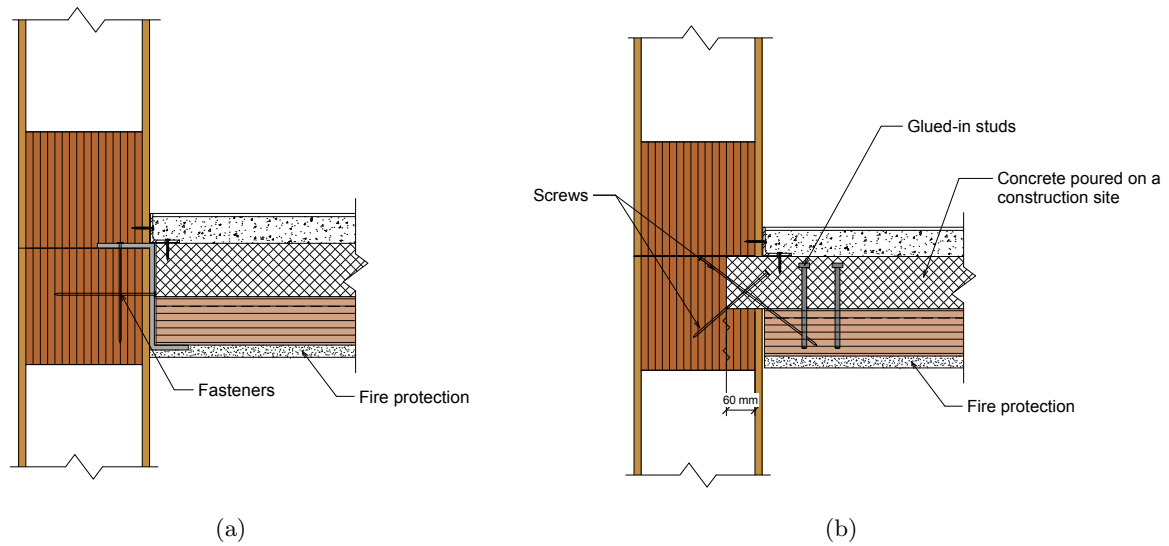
Composite slab to bearing wall connections using a steel corbel 1.6(a): using glued-in studs 1.6(b)
